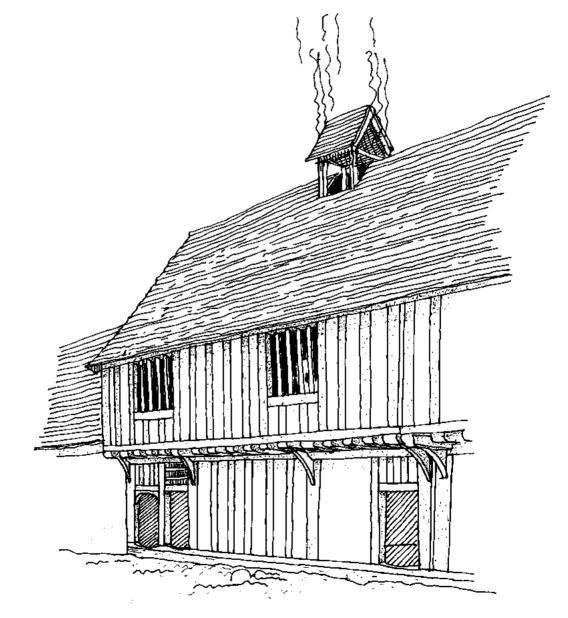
Reconstruction of medieval building, Coggeshall (not to scale).
